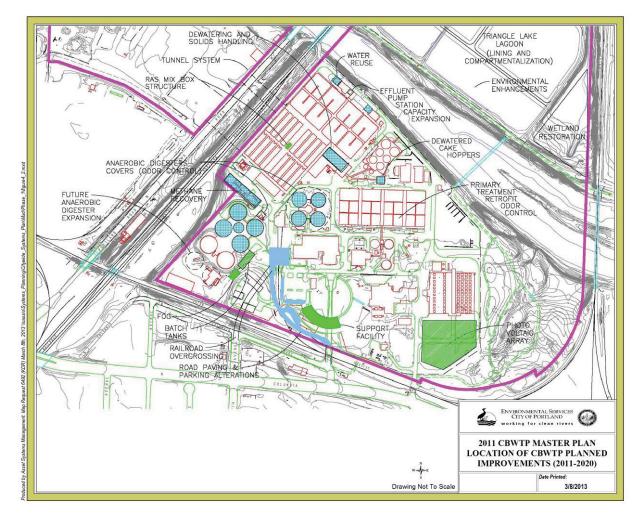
Columbia Boulevard Wastewater Treatment Plant Master Plan
